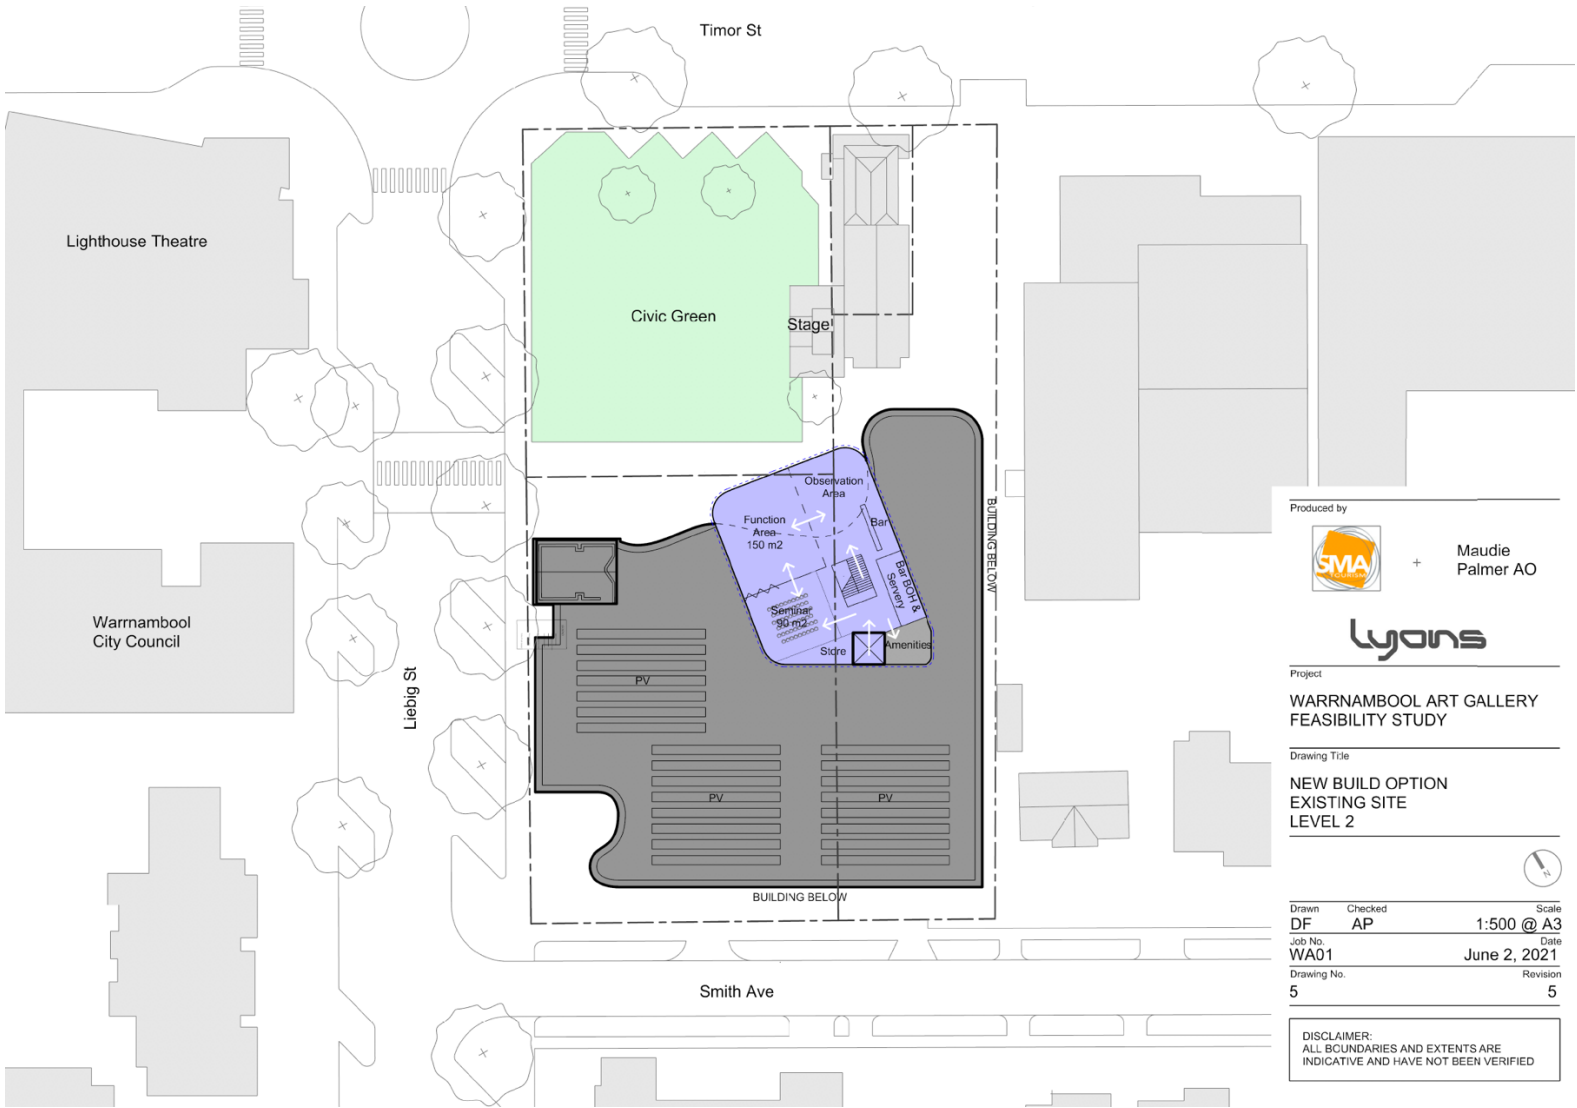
Concept Plan for a new build on current site (First Floor)
